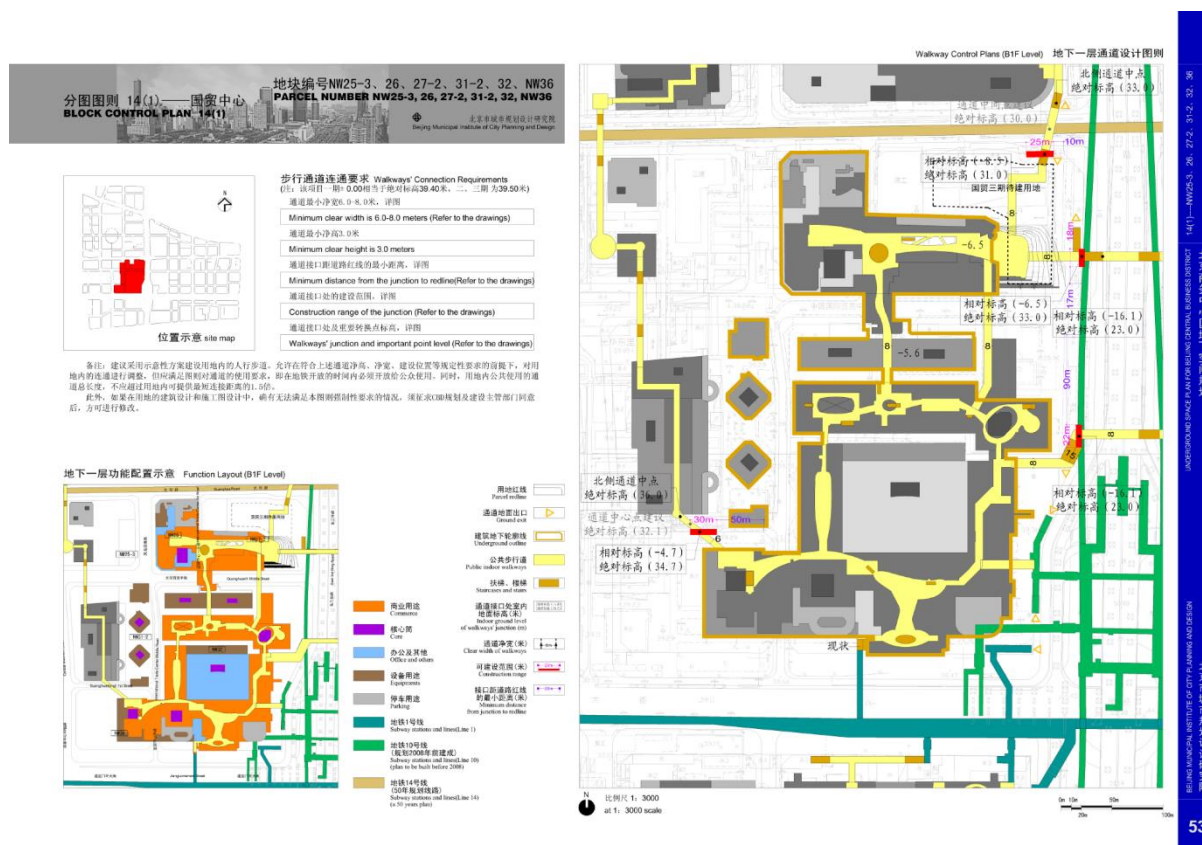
Block Control Plan in Underground Plan For Beijing Central Business District
